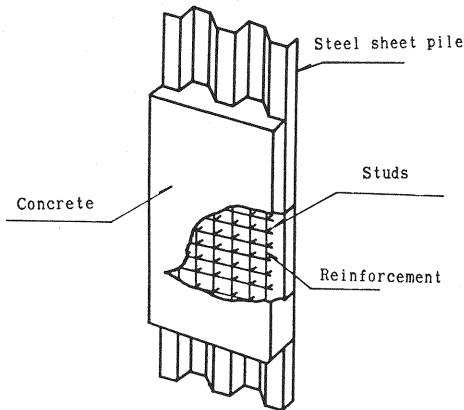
Outline of the Reinforced Concrete Covering Method.
